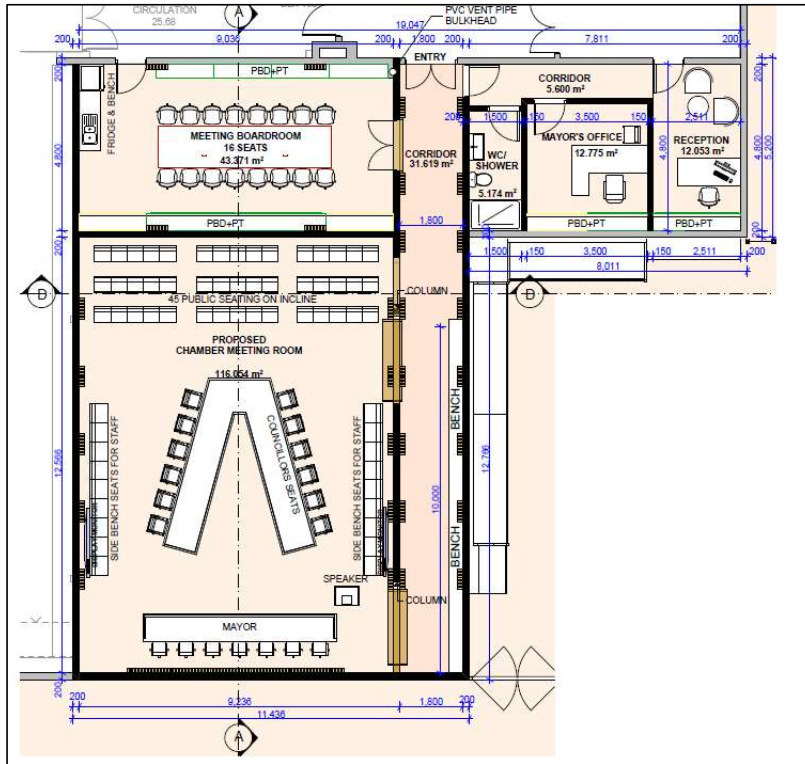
Proposed Floor Layout – Proposed Council Chamber and Meeting Room (Source: A&H Eco Group)
